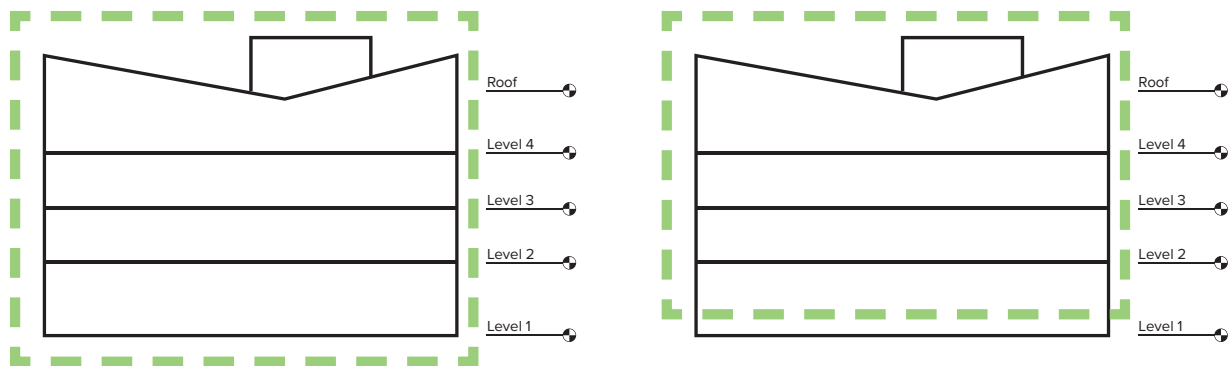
Schematic sections defining the meaning of "total building" (substructure and superstructure) (left) and "superstructure" (right)
